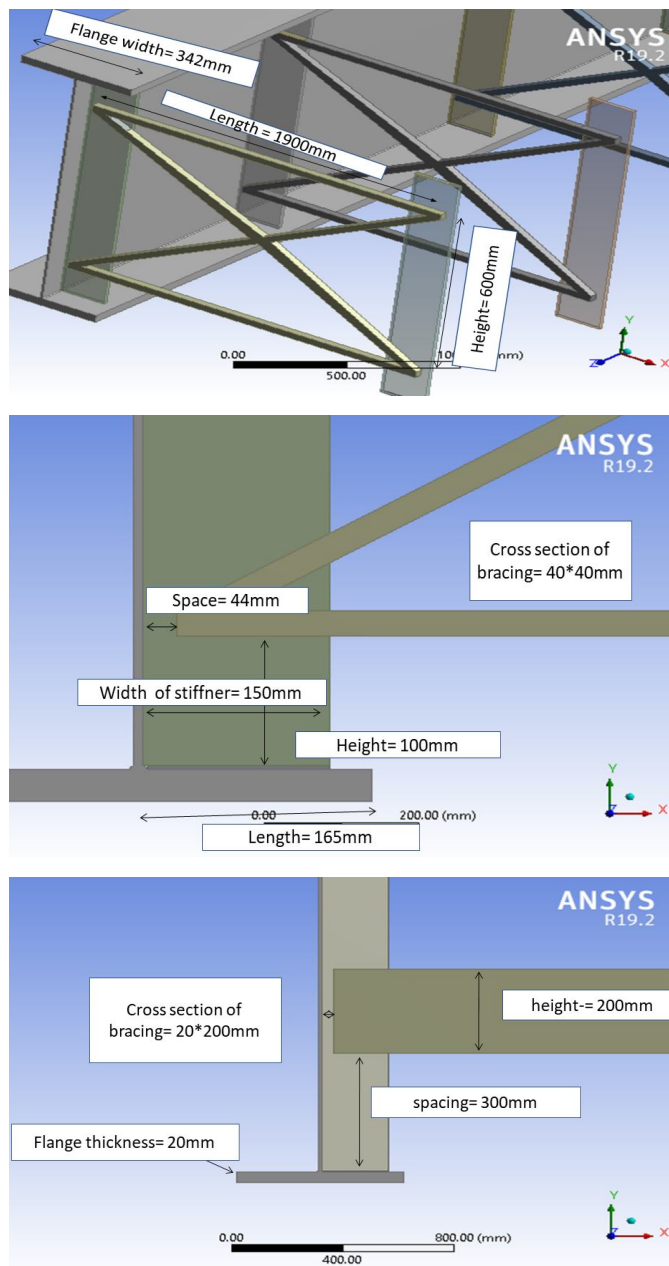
dimensions of models span, height, depth, thickness, spacing.
